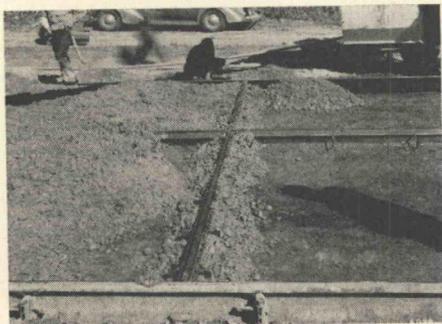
Concrete Deposited Along the Sides of an Expansion Joint
